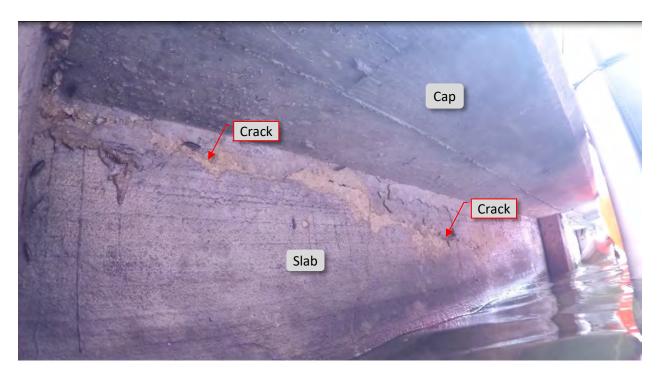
S19. STA 4+61 - 4+67. Crack at top of slab.
